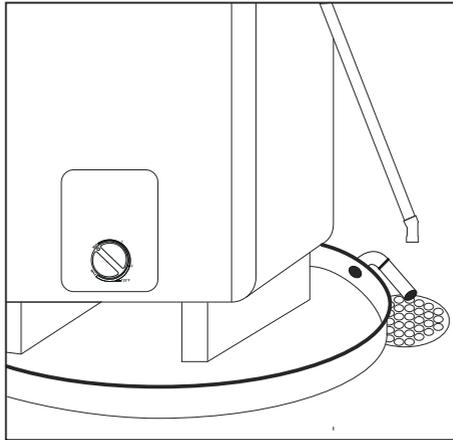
A suitable drain pan piped to an adequate drain can help protect flooring from leaks and drips.
